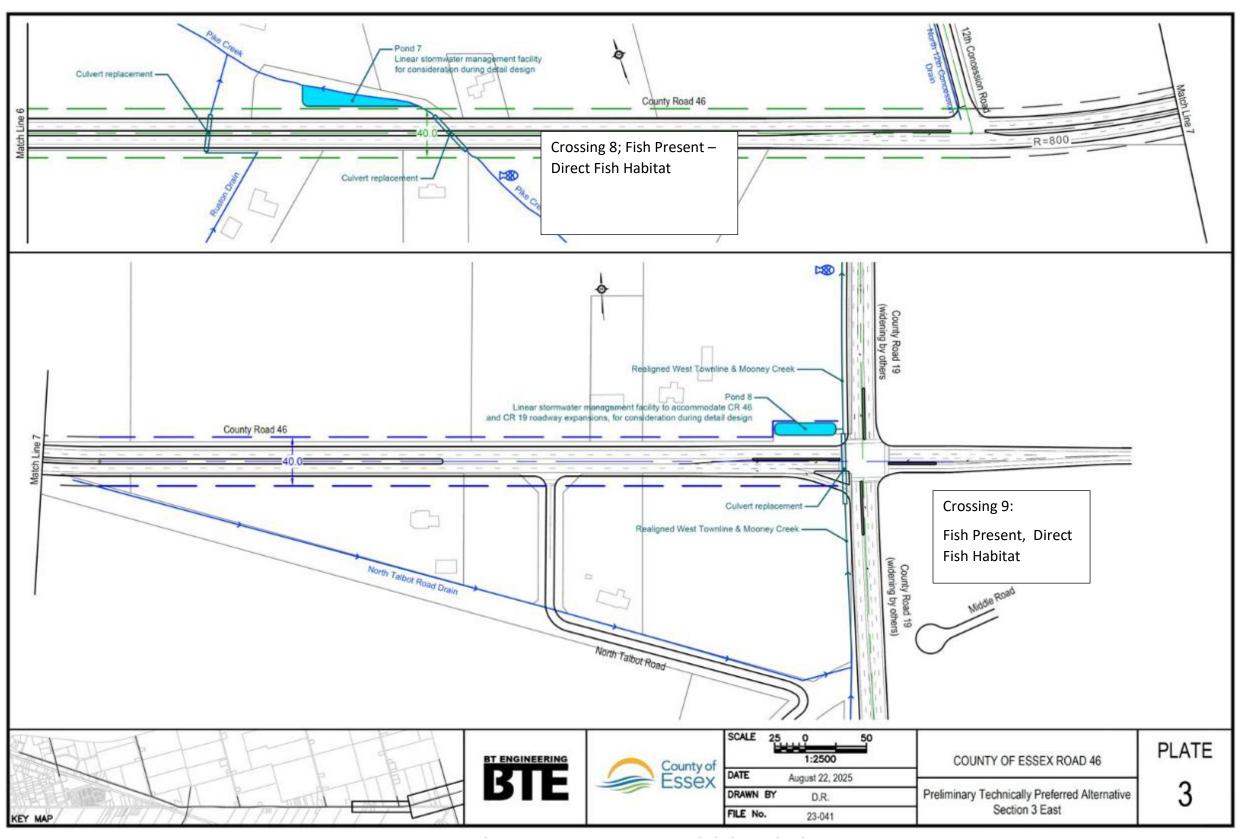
County Road 46 – Section 3 East Recommended Plan and Fisheries Locations
